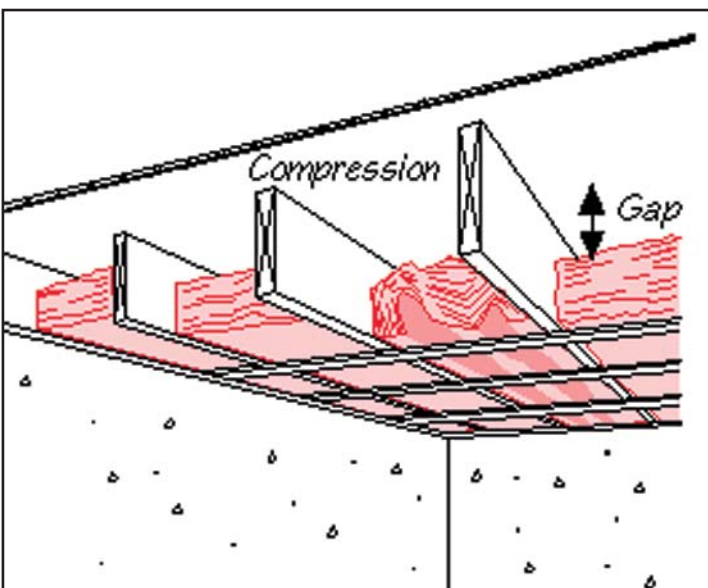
Common Floor Insulation Flaws [4.] Two common flaws in floor insulation are gaps above the batt and compression of the batt in the cavity.
